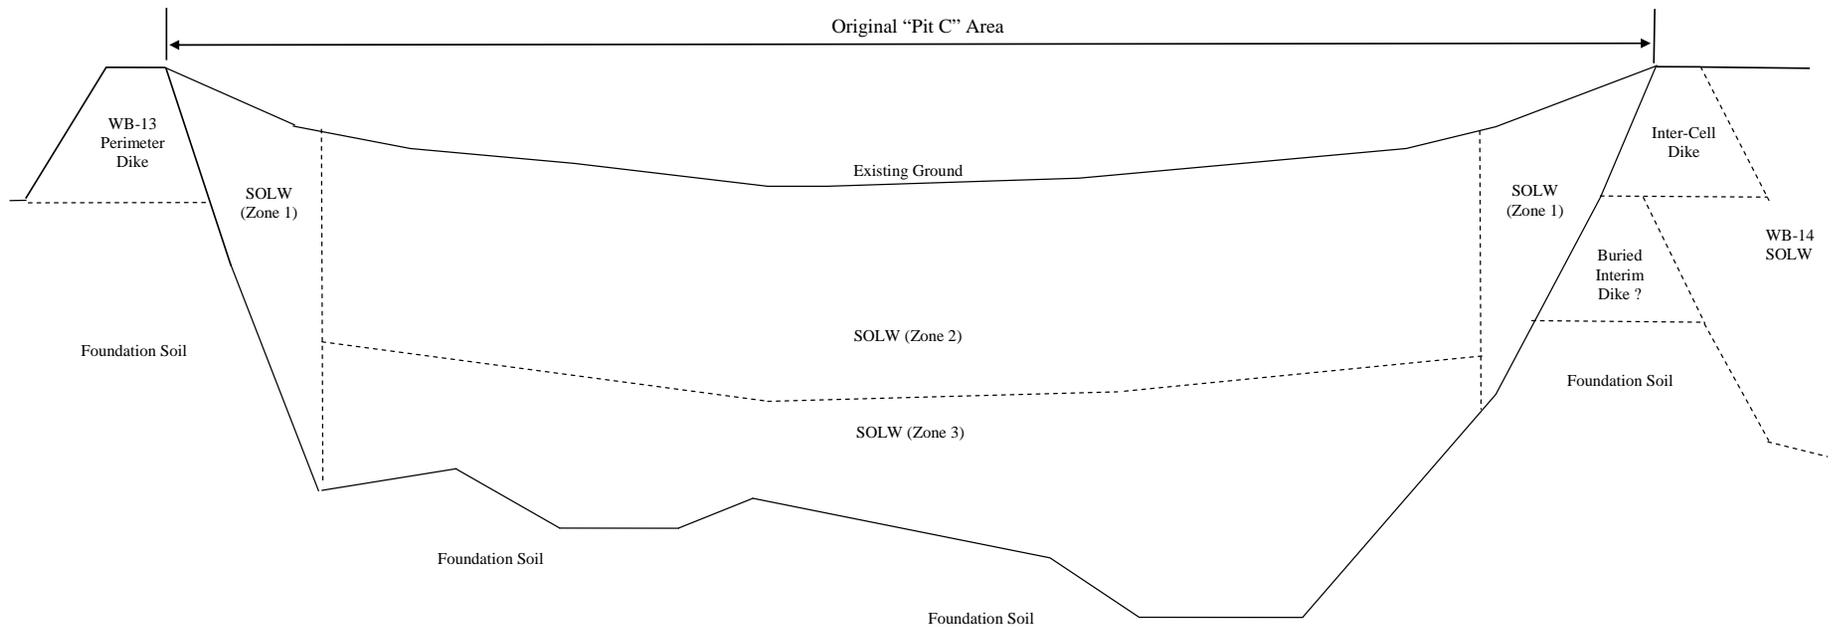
Schematic of Subsurface Profile at Cross Section C-C'
